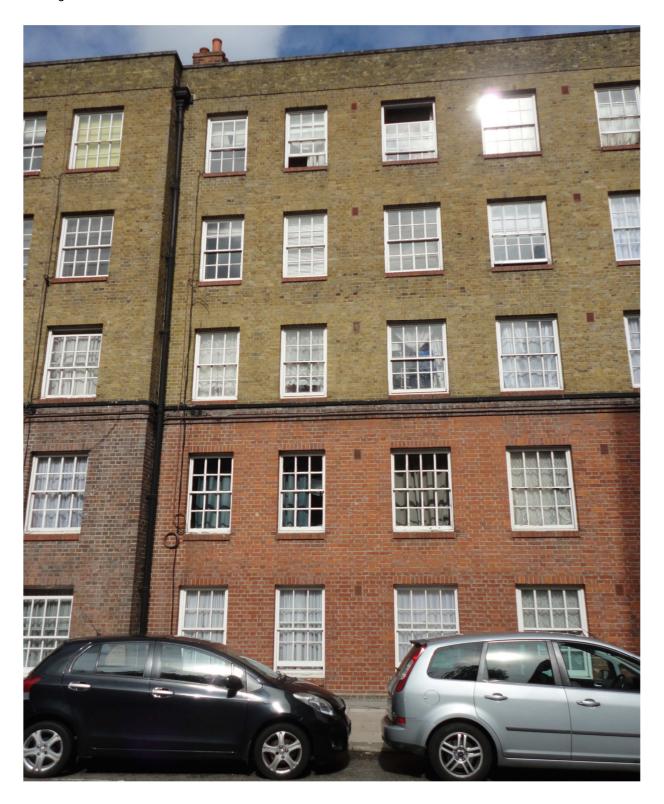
North elevation of the Redman Buildings [Block 95-117] illustrating the Crittall-type single glazed casement windows.
